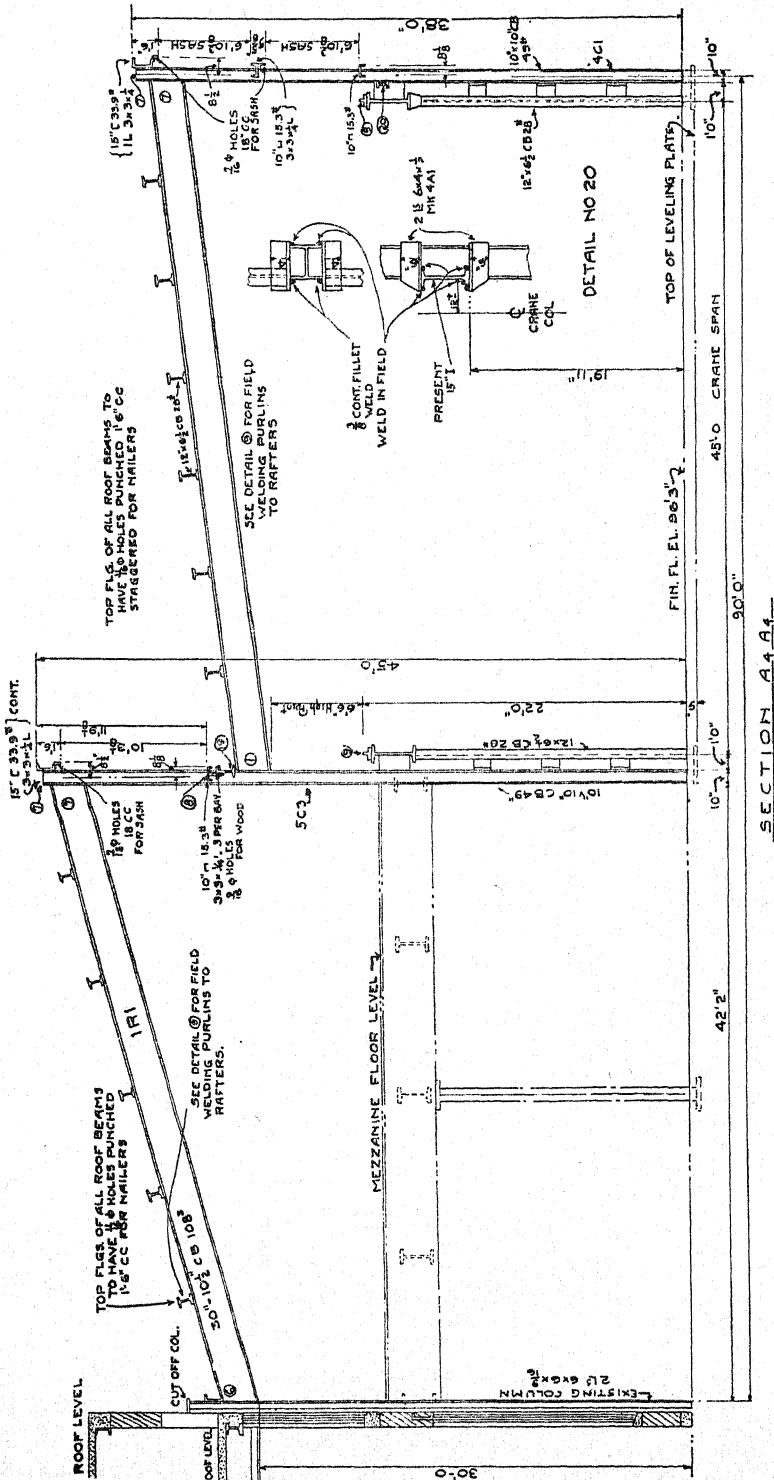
Elevation at Section A_4A_5 . See also elevations pages 466b and 466c.
